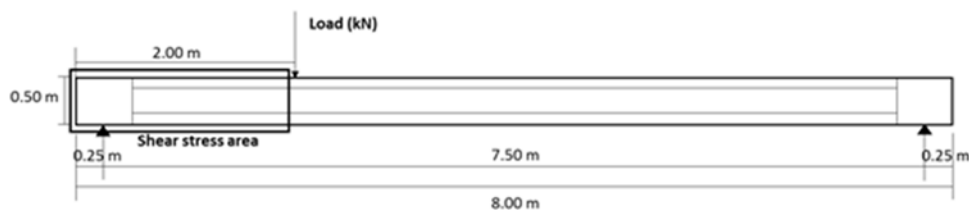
Shear test set up of beam I-1, I-2 and I-3
